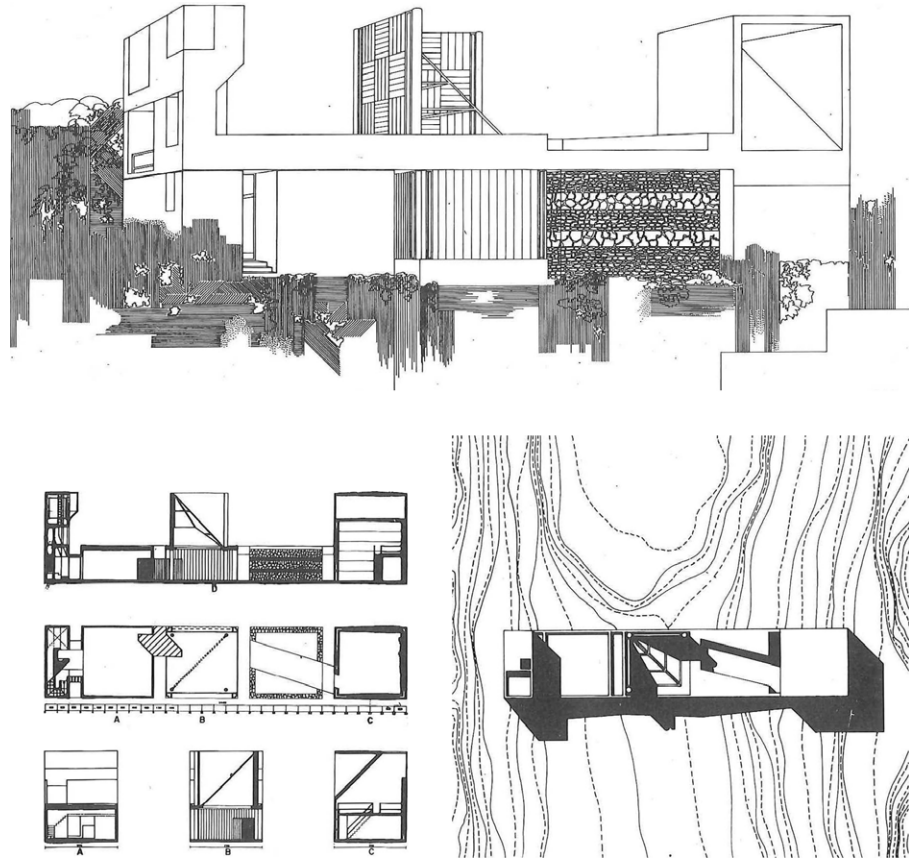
From top to bottom, left to right: Perspective view; Longitudinal section, plan and cross sections; Top view..
